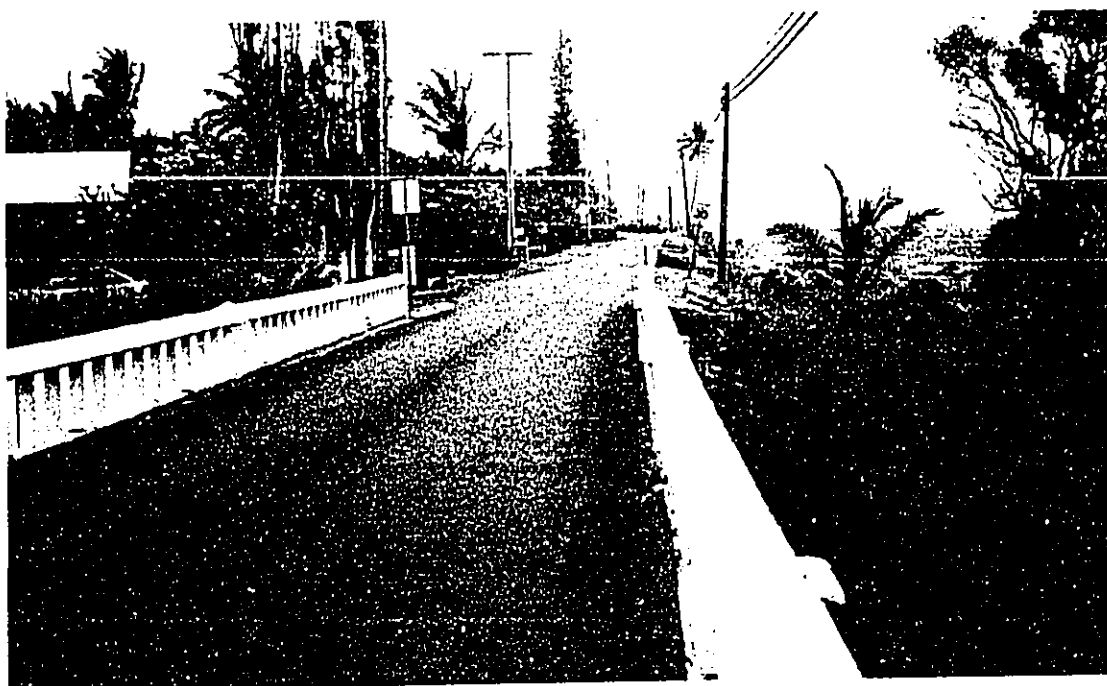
View of Waiohonu Bridge looking south-west towards Kipahulu
